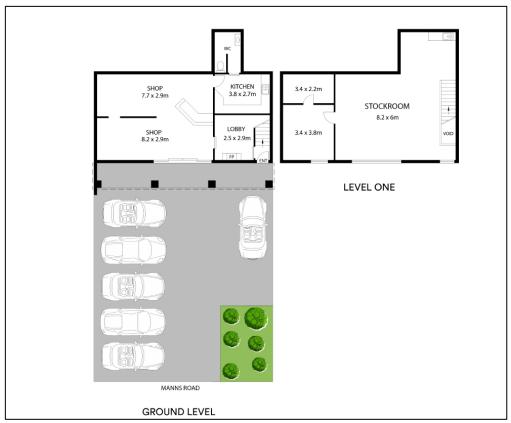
Proposed Floor Plans. Note this is orientated south to north. Source J Hancock. Accessed 24 June 2024.
